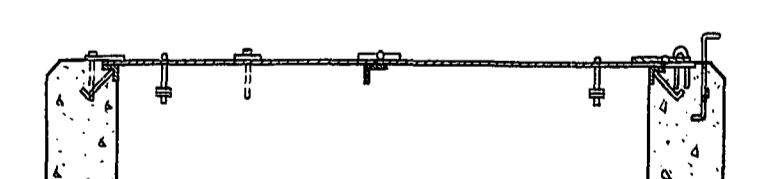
DETAIL OF SAFETY PLATFORM SIPHON INLET CHAMBER
